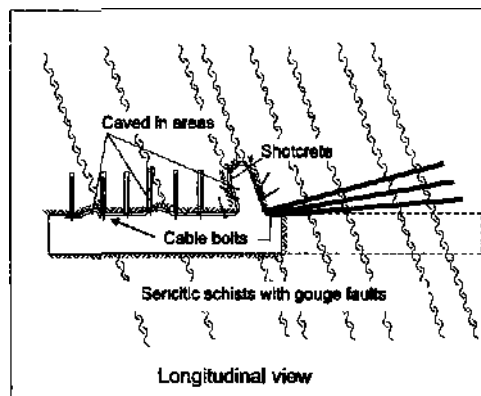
Failure patterns and pre-reinforcement with long cable bolts.
